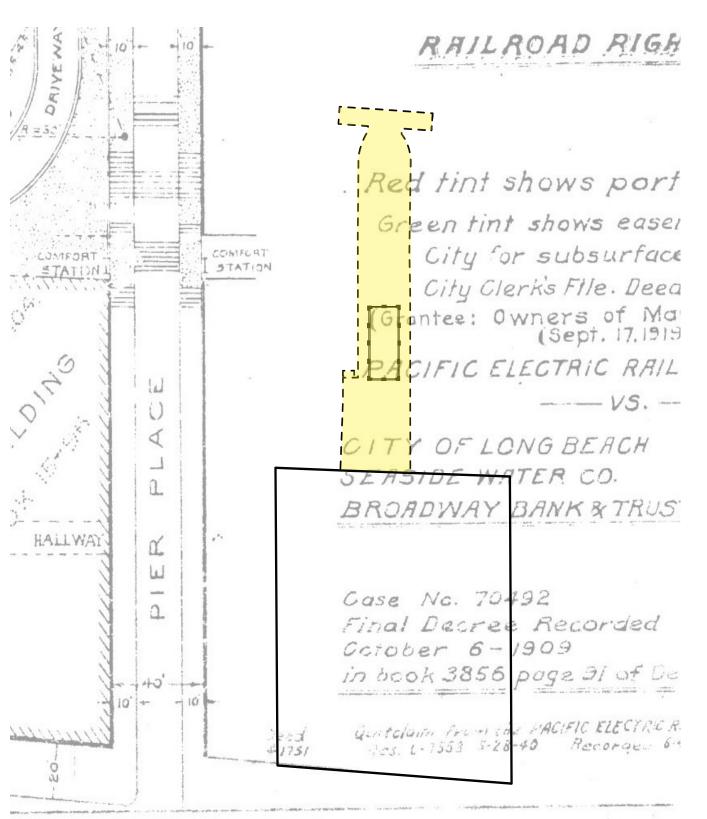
1936 site plan. Source: City of Long Beach, courtesy of GBD Architects.
